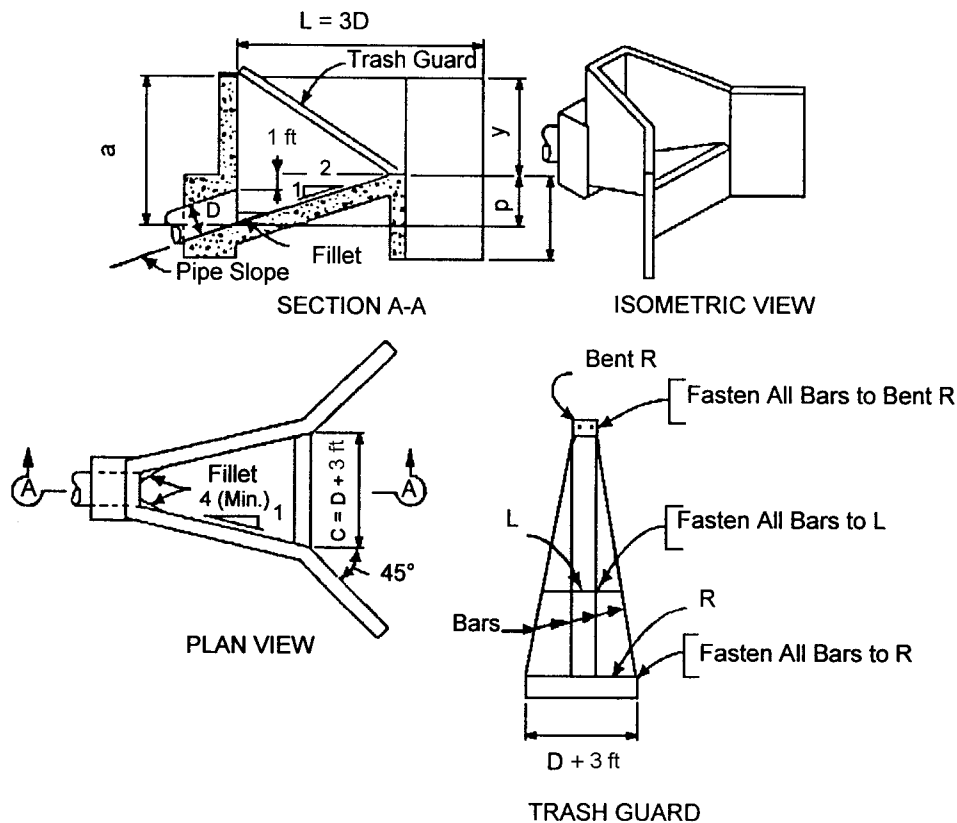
B-3 — Geometry For Inlet and Outlet
